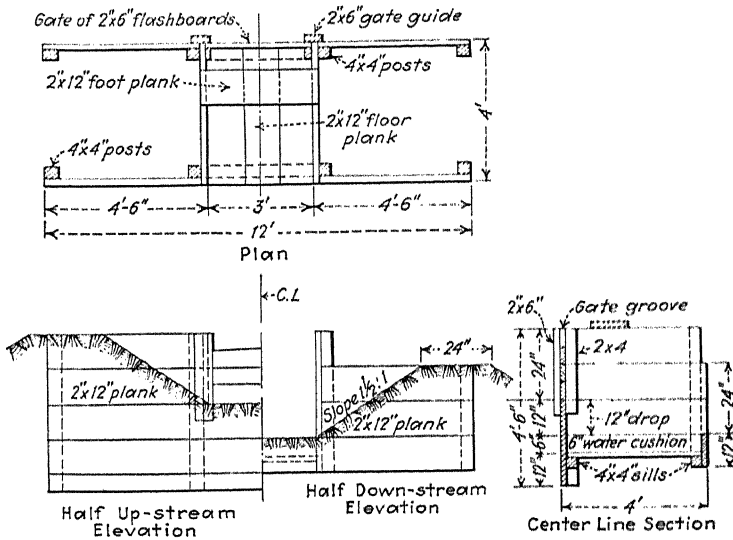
Wooden drop for 1-ft. fall on ditch 3 ft. wide.
